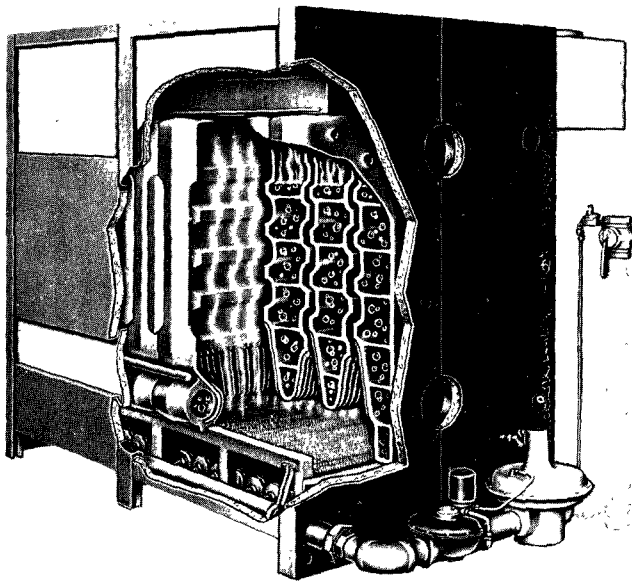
A cast iron sectional boiler (Crane Co., Johnstown, Pa.).
